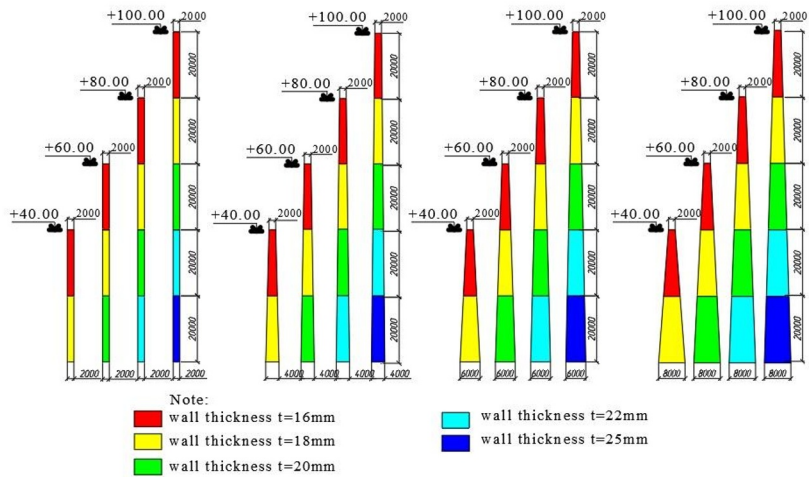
Design tower’s dimensions for Turbowind T 600-48
